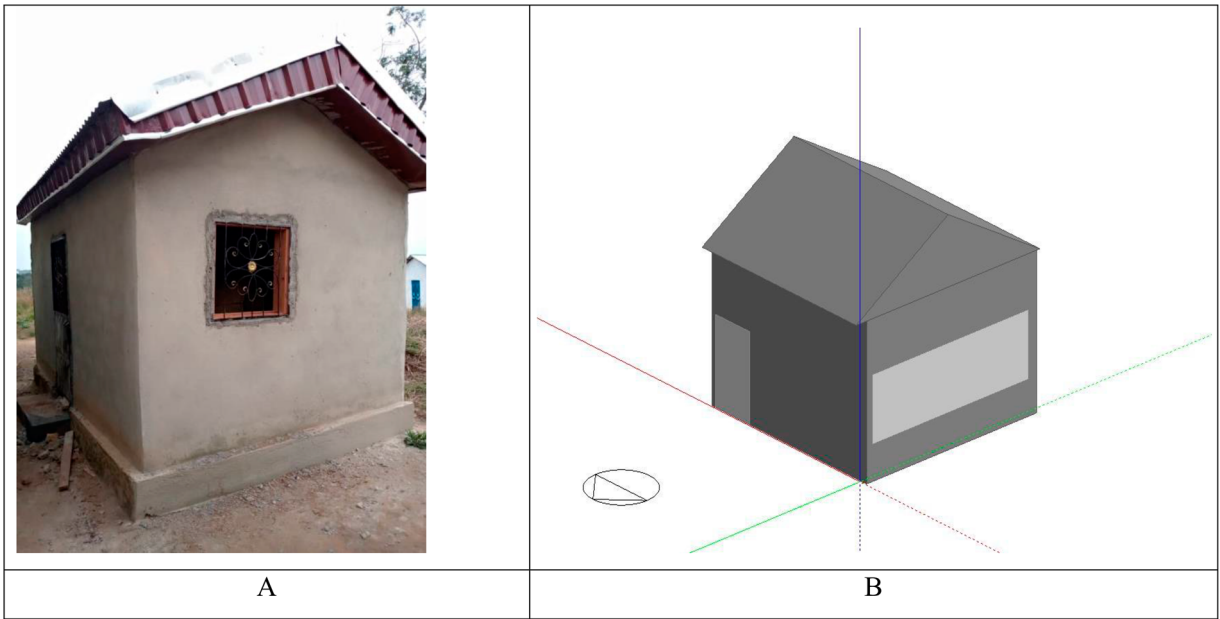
(A) A single-room building in north Cameroon (B) 3D building in design builder.
